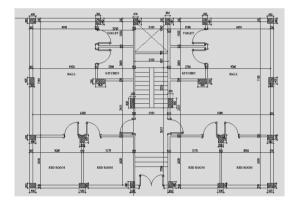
Arch. As Built Drawing for Ground Floor Plan for Selected Building
